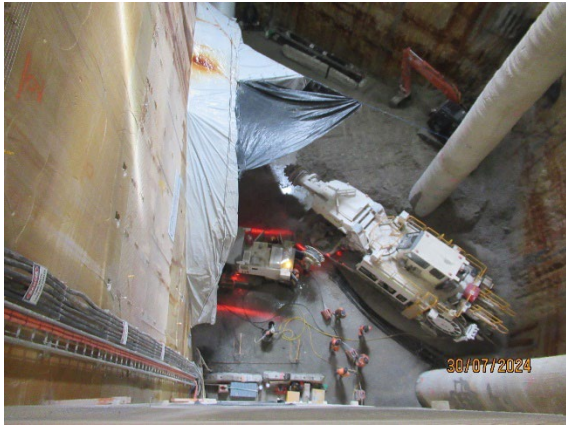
Pyrmont East: Tunnelling by road header 24/7 with roof support and ventilation activities ongoing.
